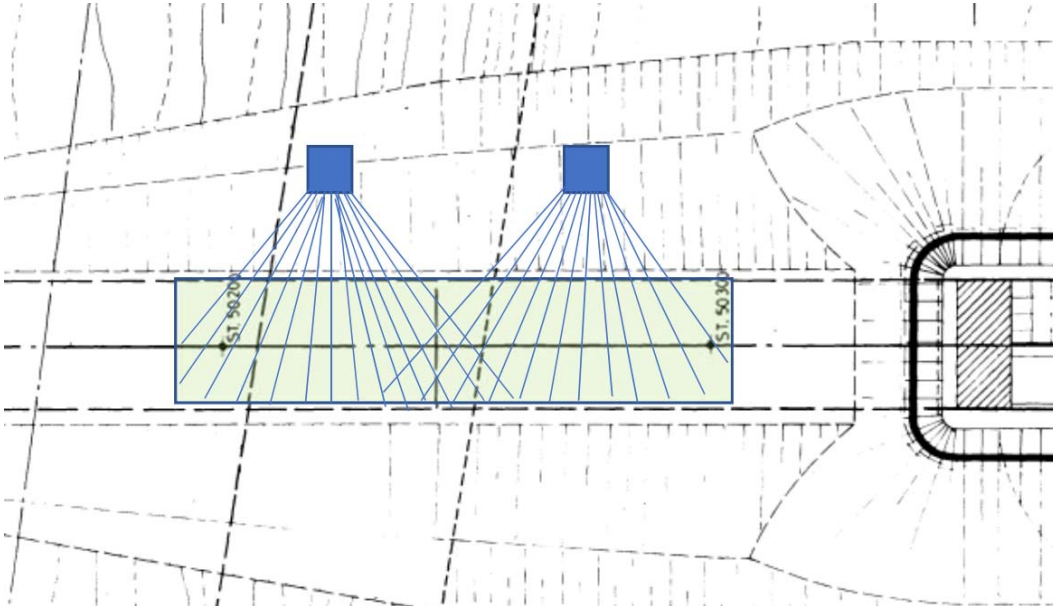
Plan showing indicative layout of grout injection tubes.
